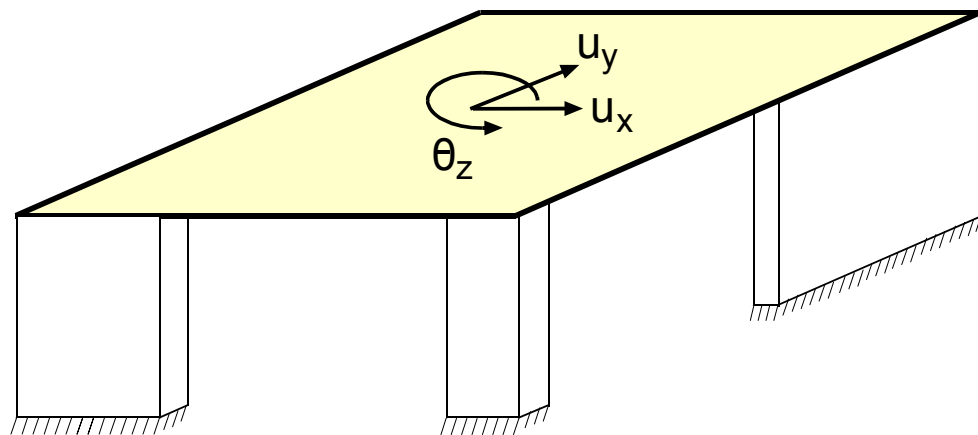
Reduced Degrees of Freedom at the Floor of a Single Storey Building Structure
